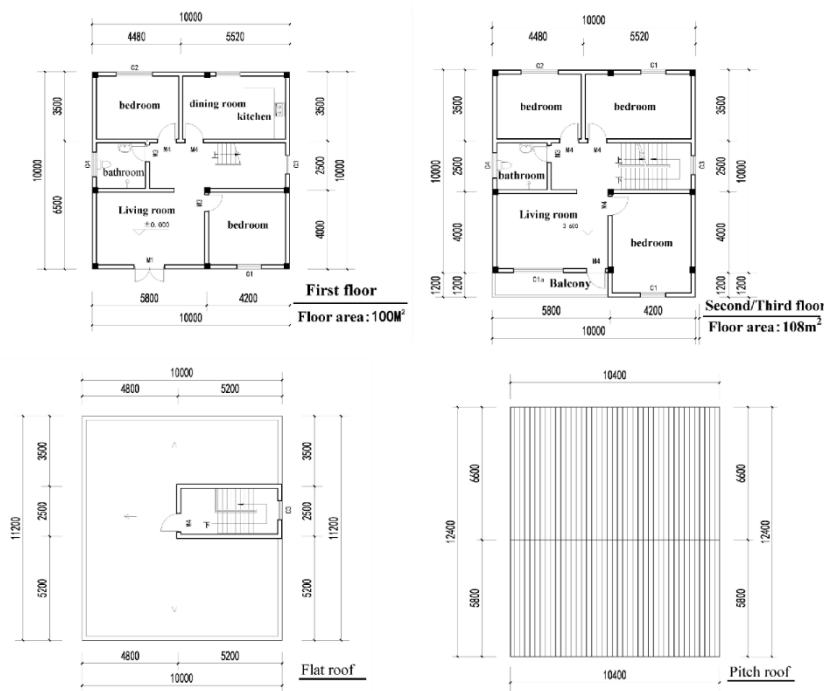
Plan of each floor of the study cases (2-story and 3-story).
